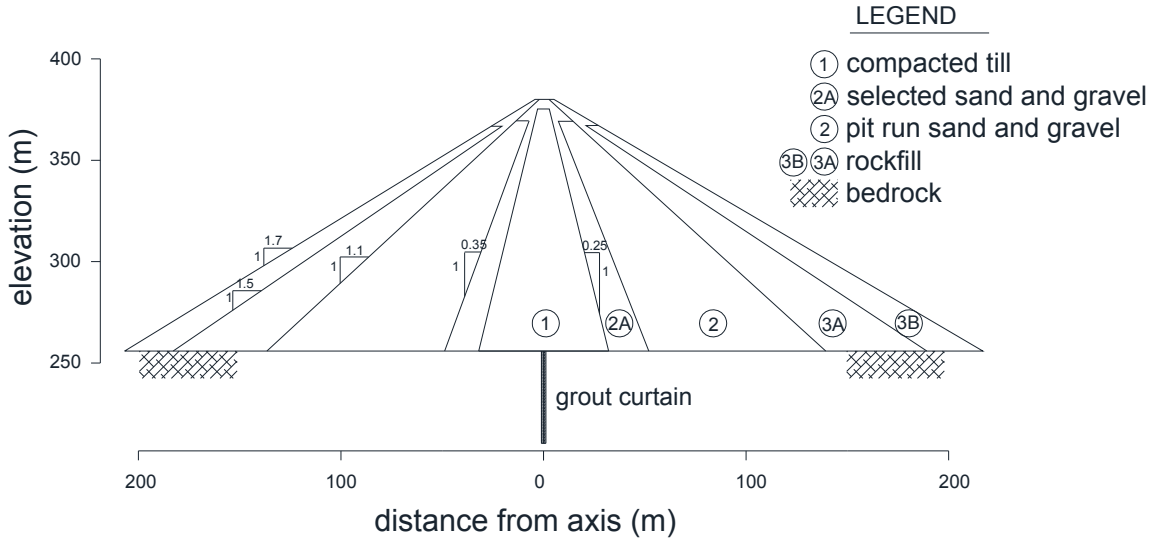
Cross section of LG4 dam at highest elevation of the crest
